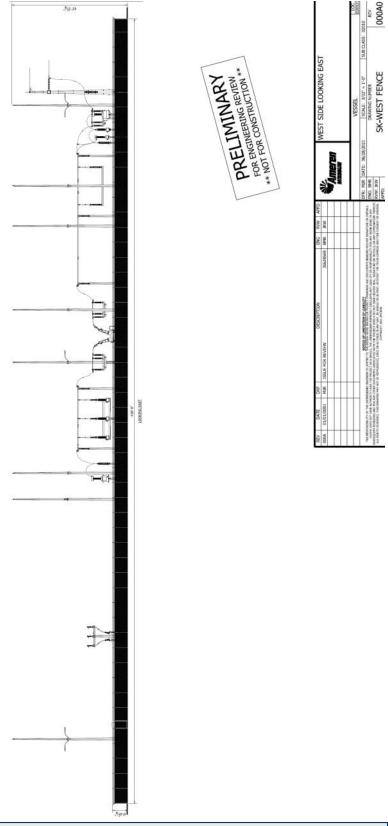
EXHIBIT C: SECTION VIEWS, 4 (WEST FENCE LOOKING EAST)
